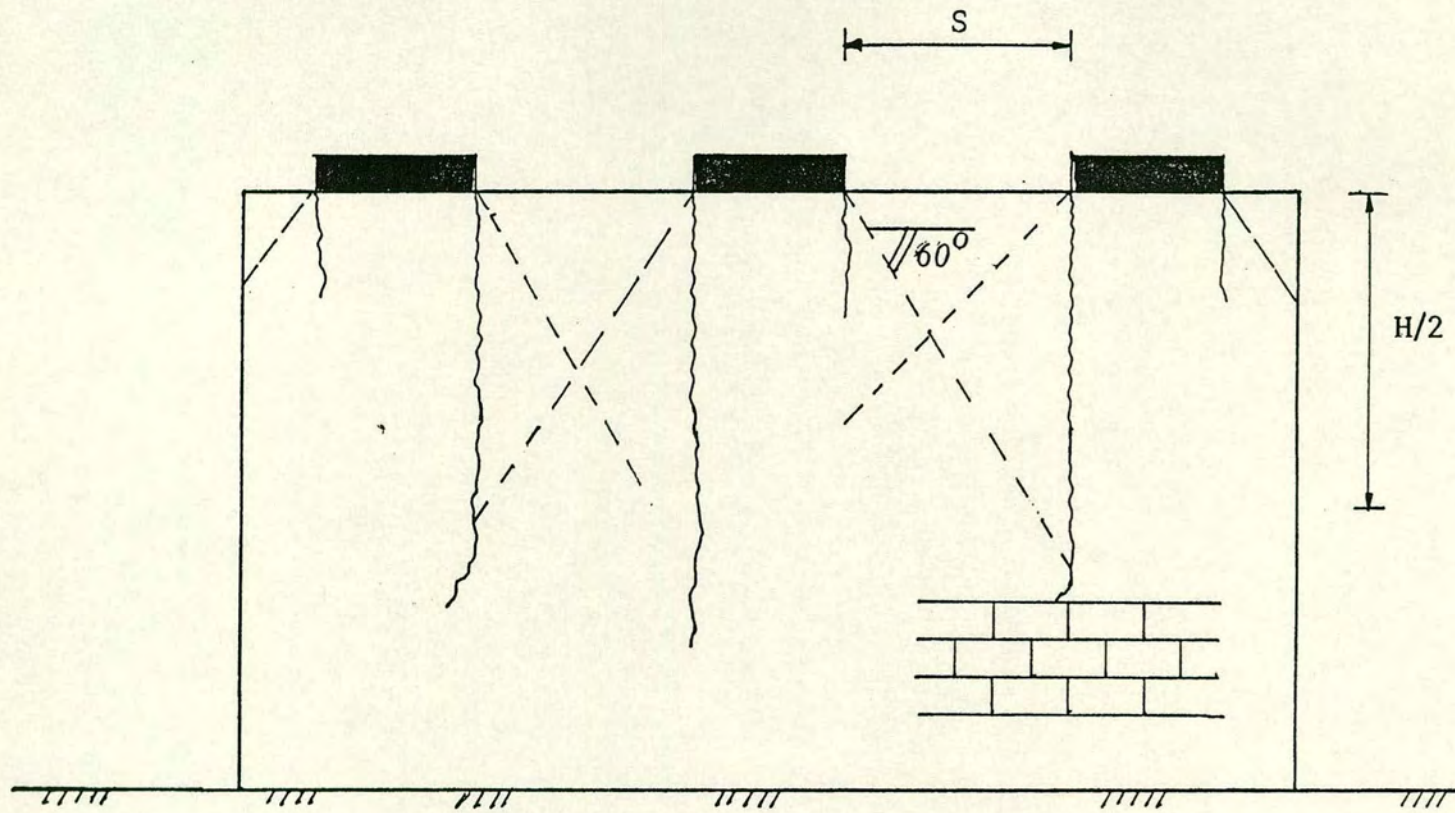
Failure of pocket type brick masonry subjected to vertical concentrated eccentric load
